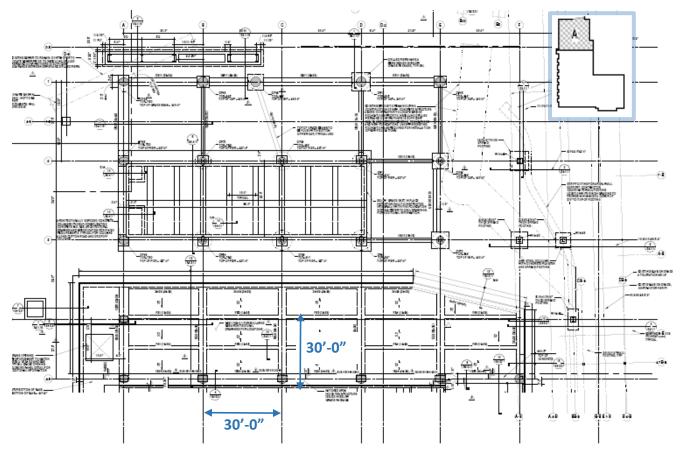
| Partial Foundation Plan (Courtesy of Walter P. Moore)
